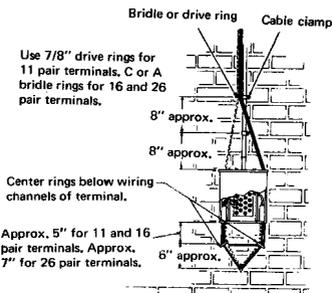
Building Mounted Cable Terminal (Top Entrance)
